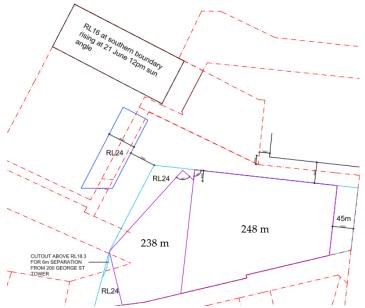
Elevation drawing of tower envelope refinements (Hassell 005567-61A-P)
